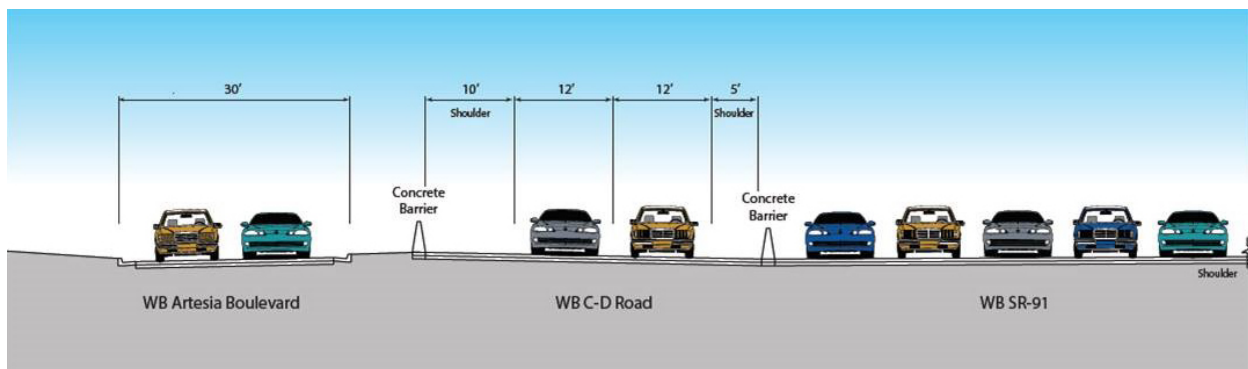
Proposed C-D Road SR-91 Westbound (conceptual cross section)
